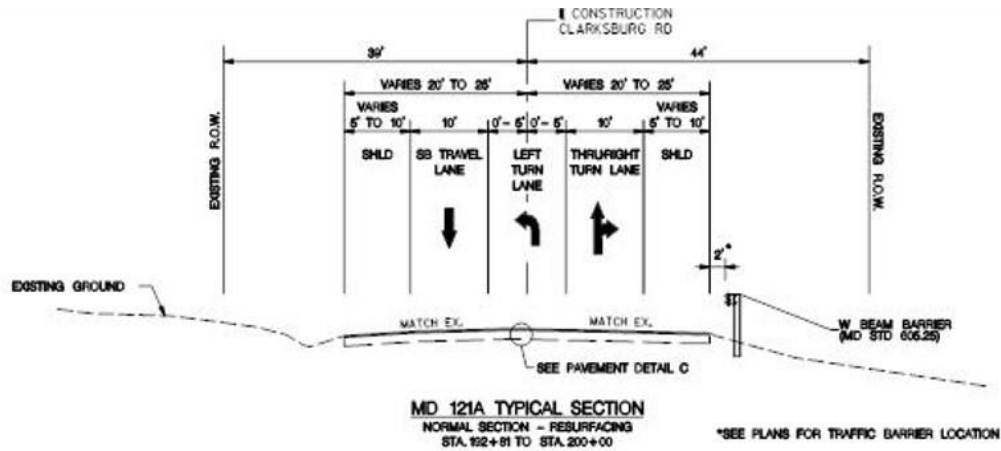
MD 121A (Clarksburg Road) Typical Cross Section
